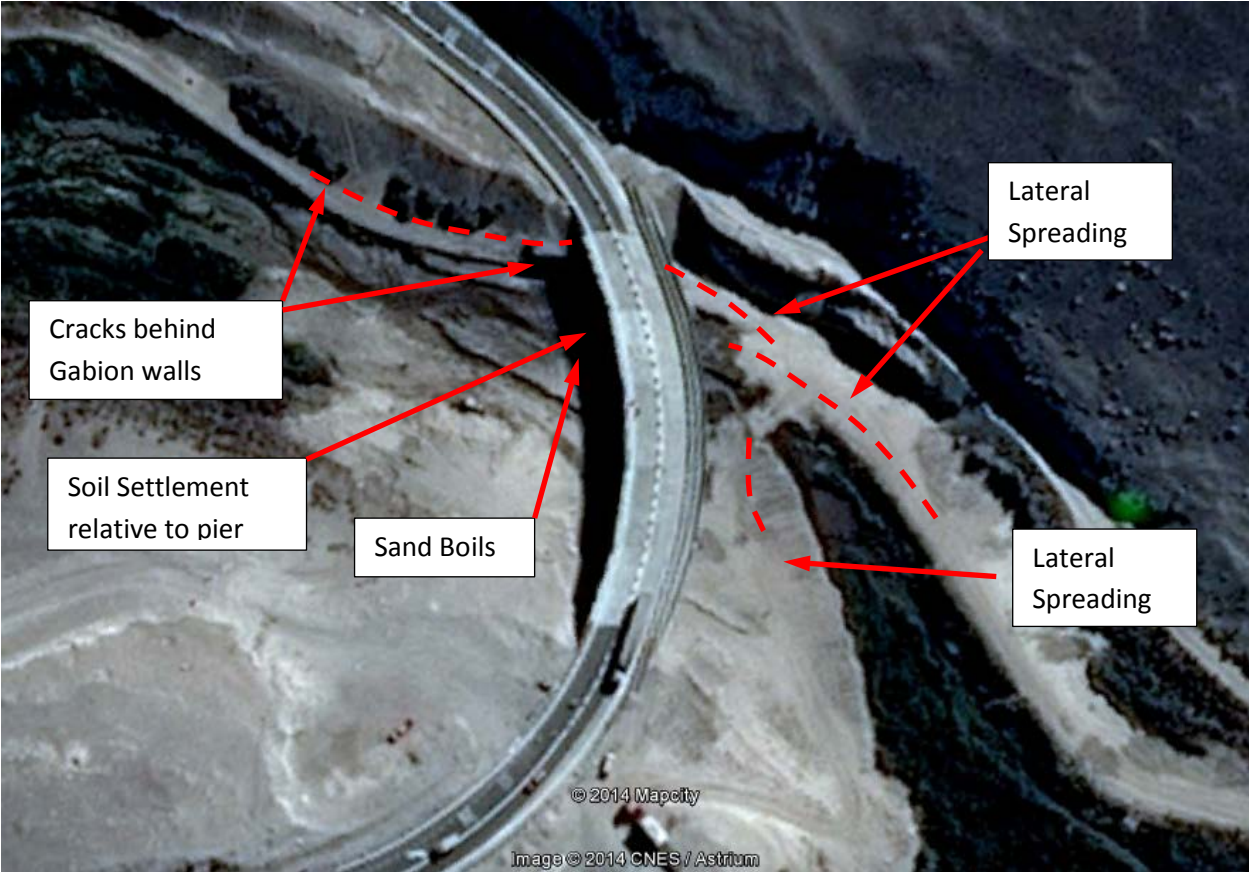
Photograph showing cracks paralleling the stream channel below the Tiliviche bridge (-19.551966°, -69.940921°).
